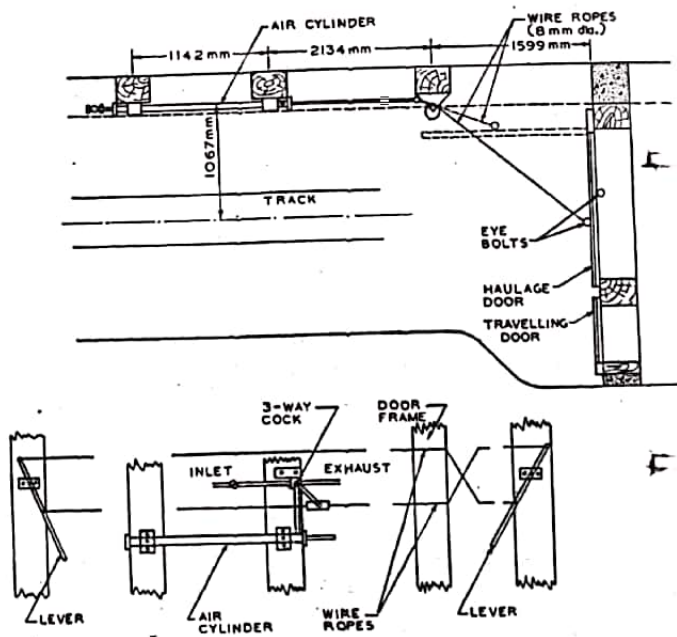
Compressed-air operated remote-control device for ventilation door.
